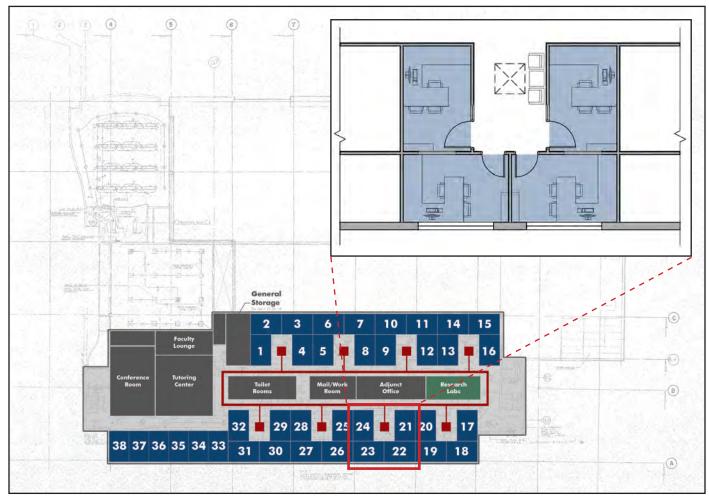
Concept 2 - Second Floor (Phase 1)
